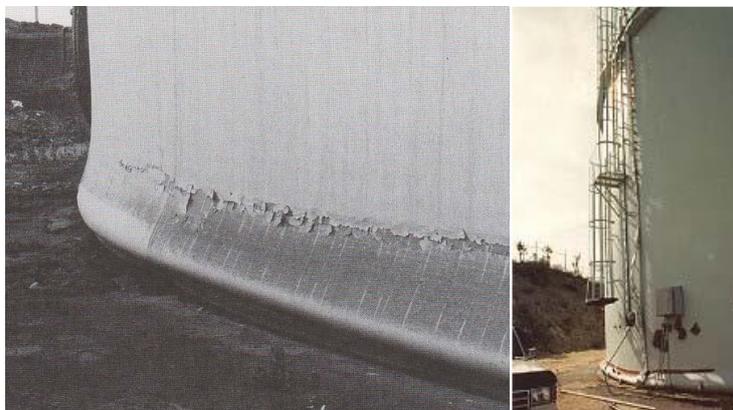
Elephant foot buckling of a bolted steel tank
